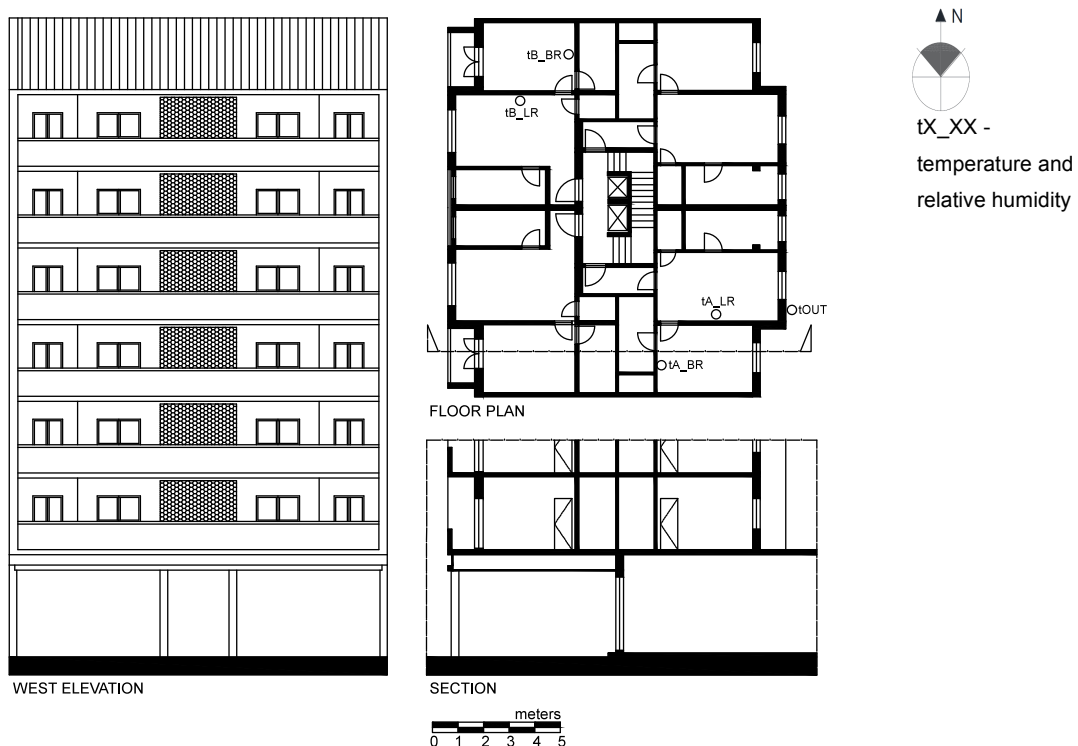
Case study building: West Elevation; Section and Floor Plan with temperature sensor positioning
